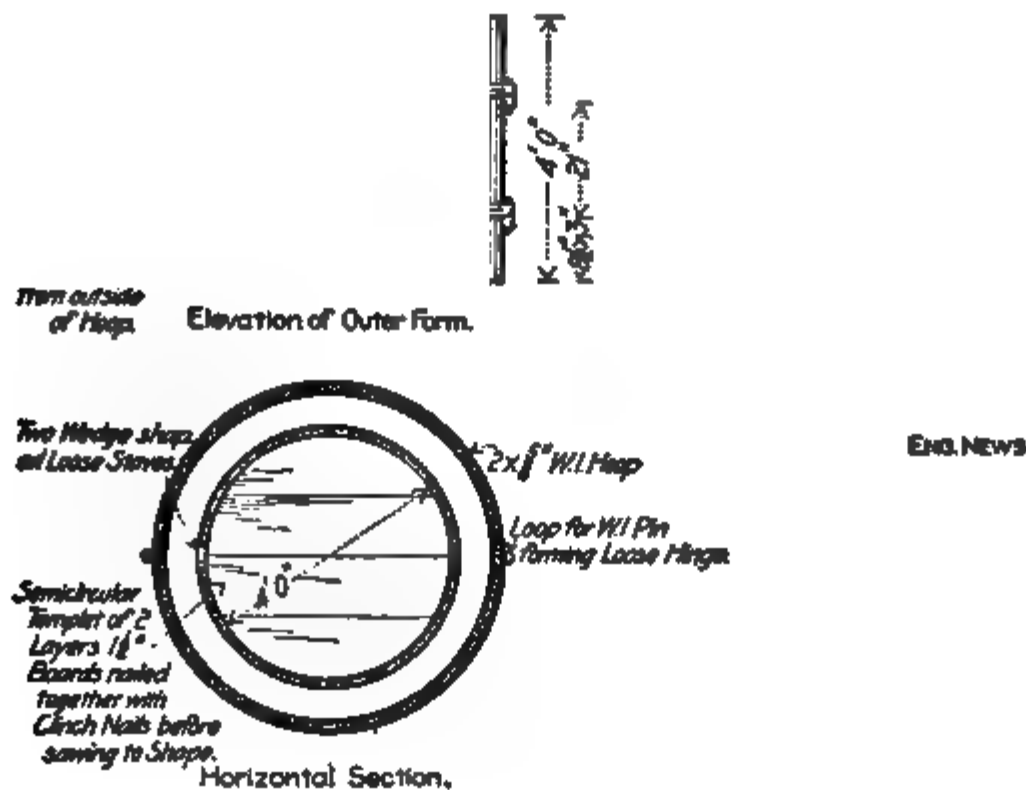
FORMS FOR MOLDING REINFORCED CONCRETE CULVERT PIPE.
